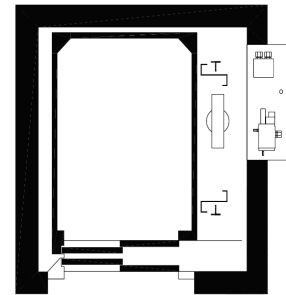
Roped hydraulic lift – floor plan (basis for calculation example)
